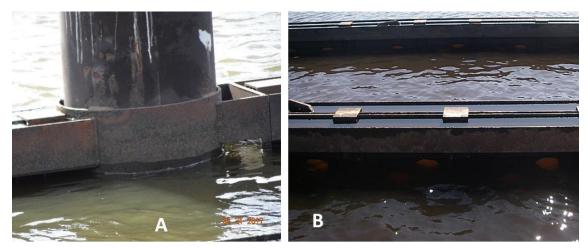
(A) Rust was observed on the steel piles and beam that support the Wave Screen System. (B) Water was trapped on the top surface of the beams.
